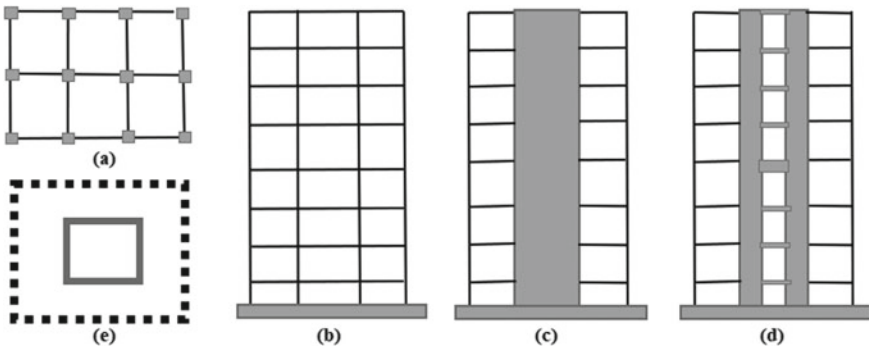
Earthquake-resistant systems in RCC buildings: a floor plan, b moment resisting frame, c structural shear wall, d coupled shear wall, e tube system
